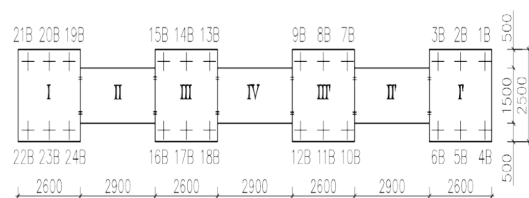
Line B in St. John's Church (overhead view) work joints and piles.
